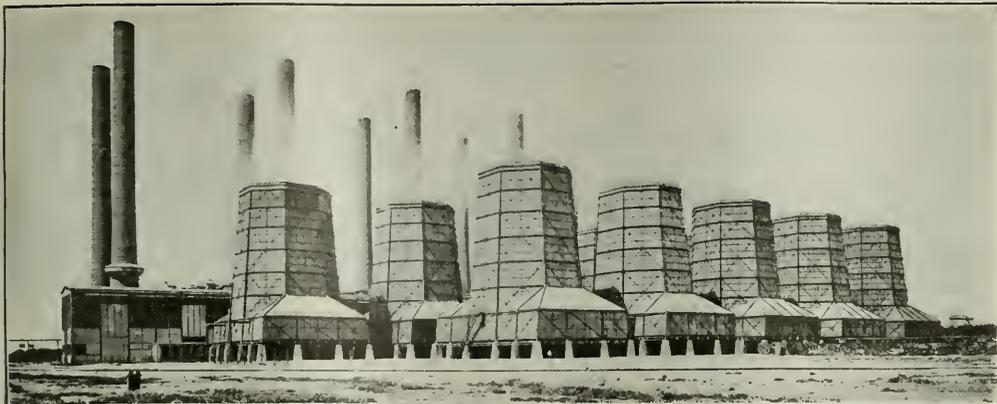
COOLING TOWERS AT ZSCHORNEWITZ-GOLPA POWER PLANT WITH POWER HOUSE IN BACKGROUND
